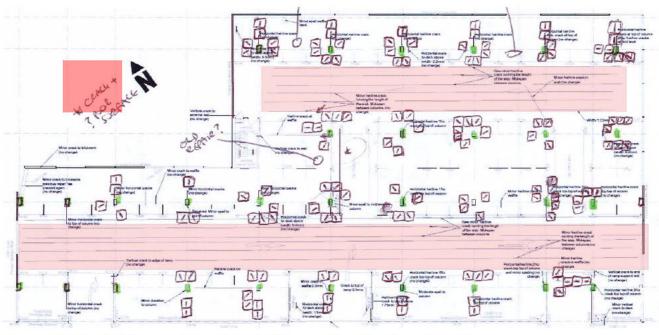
Deck 6 (underside of deck 8) inspection findings Nov 23.
